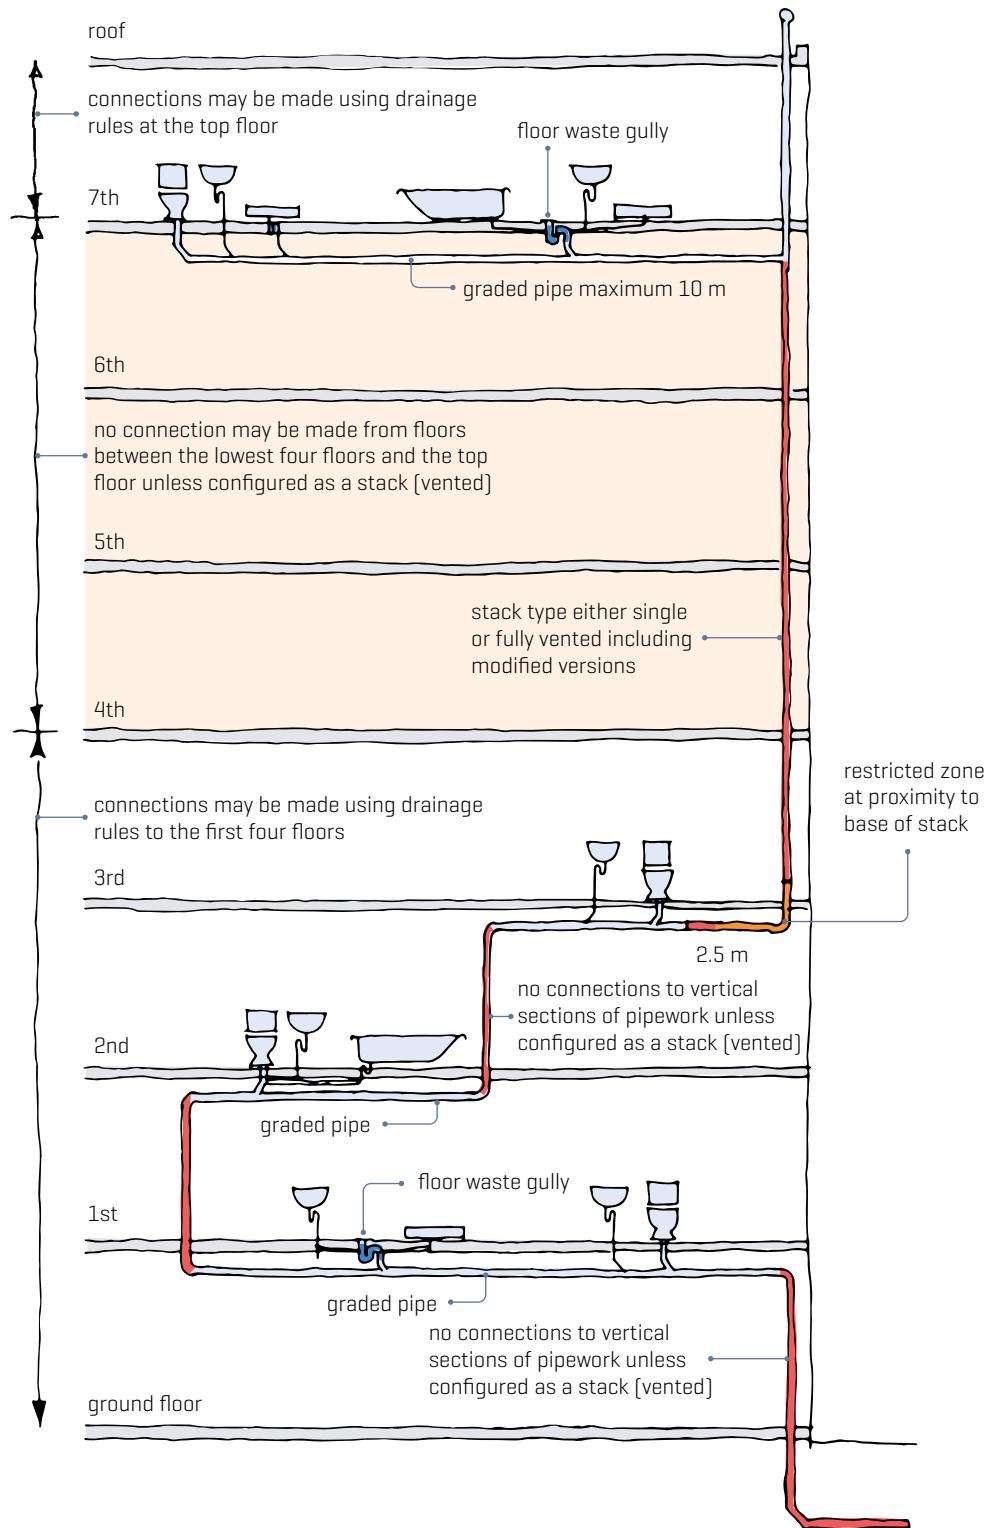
Pipework using drainage principles applied to a multi-storey building.
